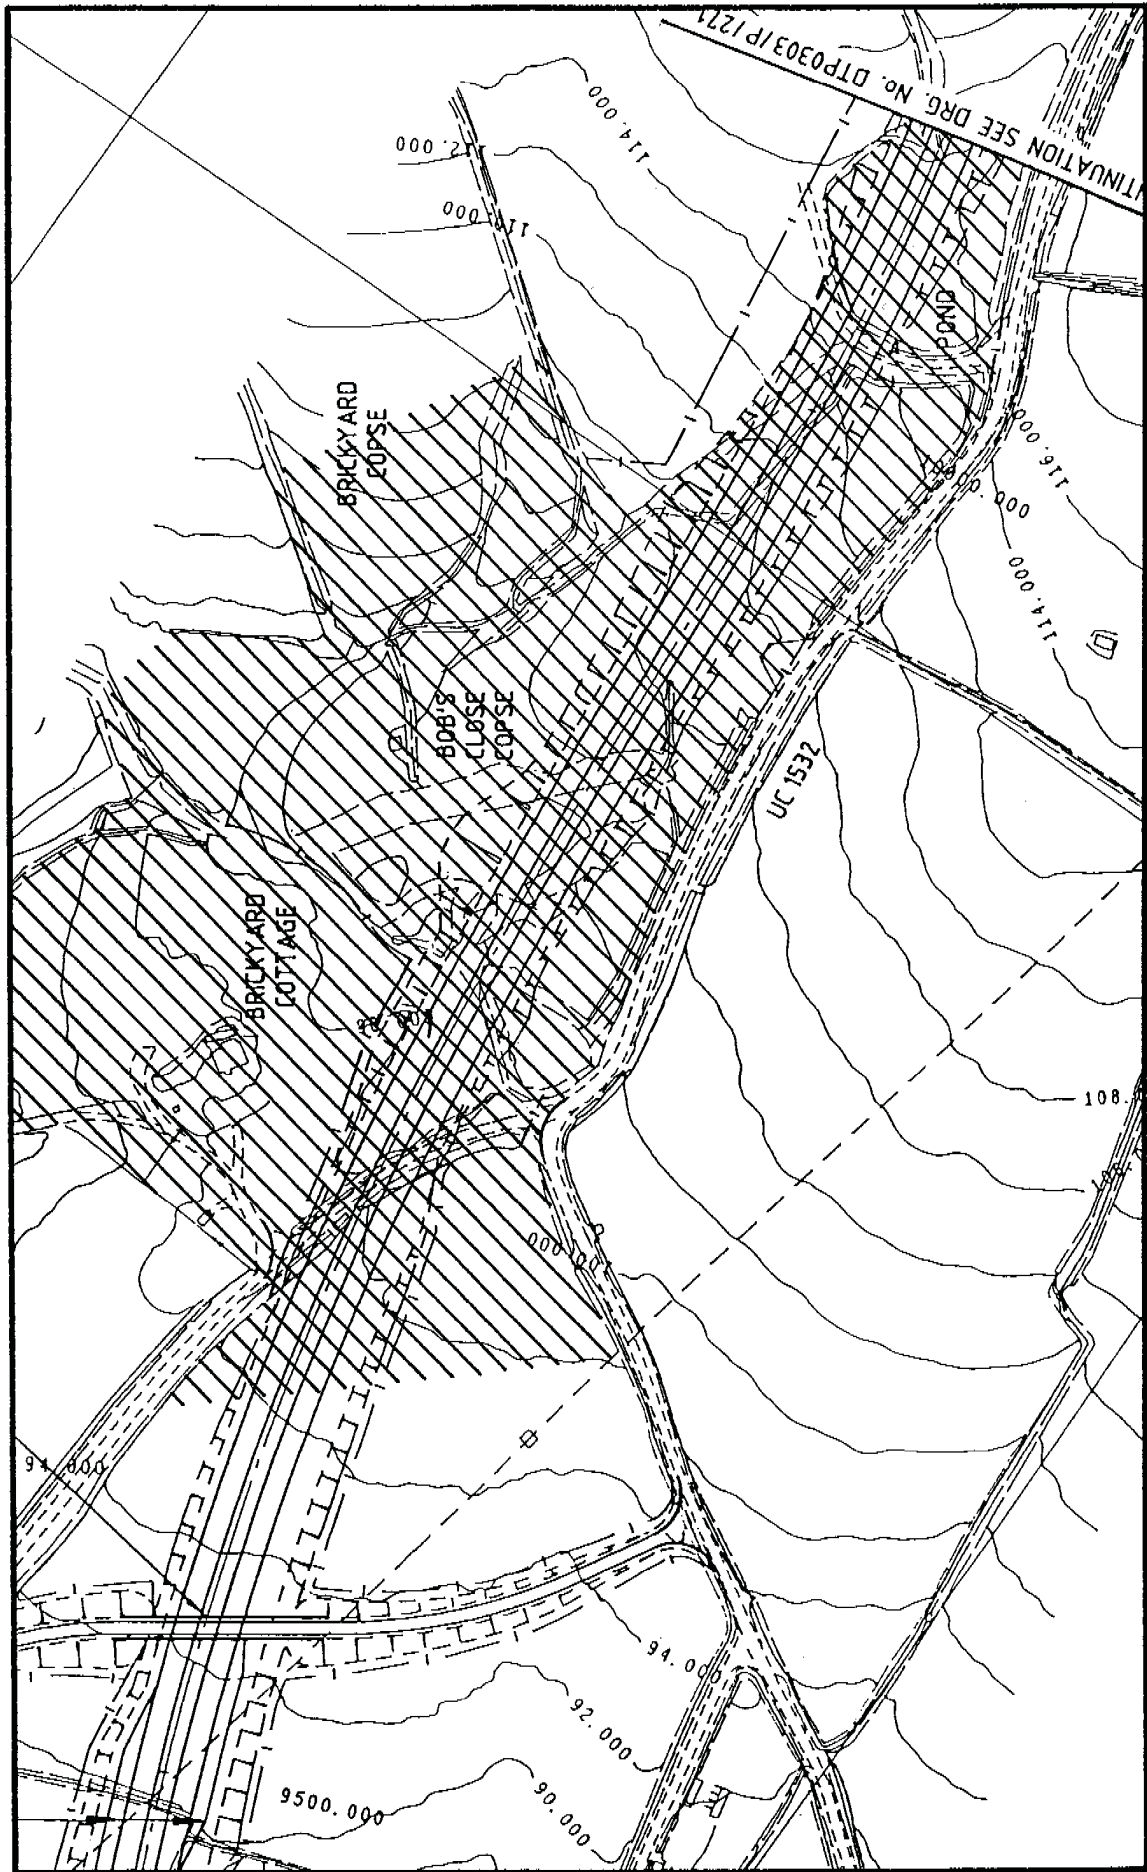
The brickyard (Site 16) showing extent of areas of particular archaeological interest (shaded) in relation to preliminary design layout.
